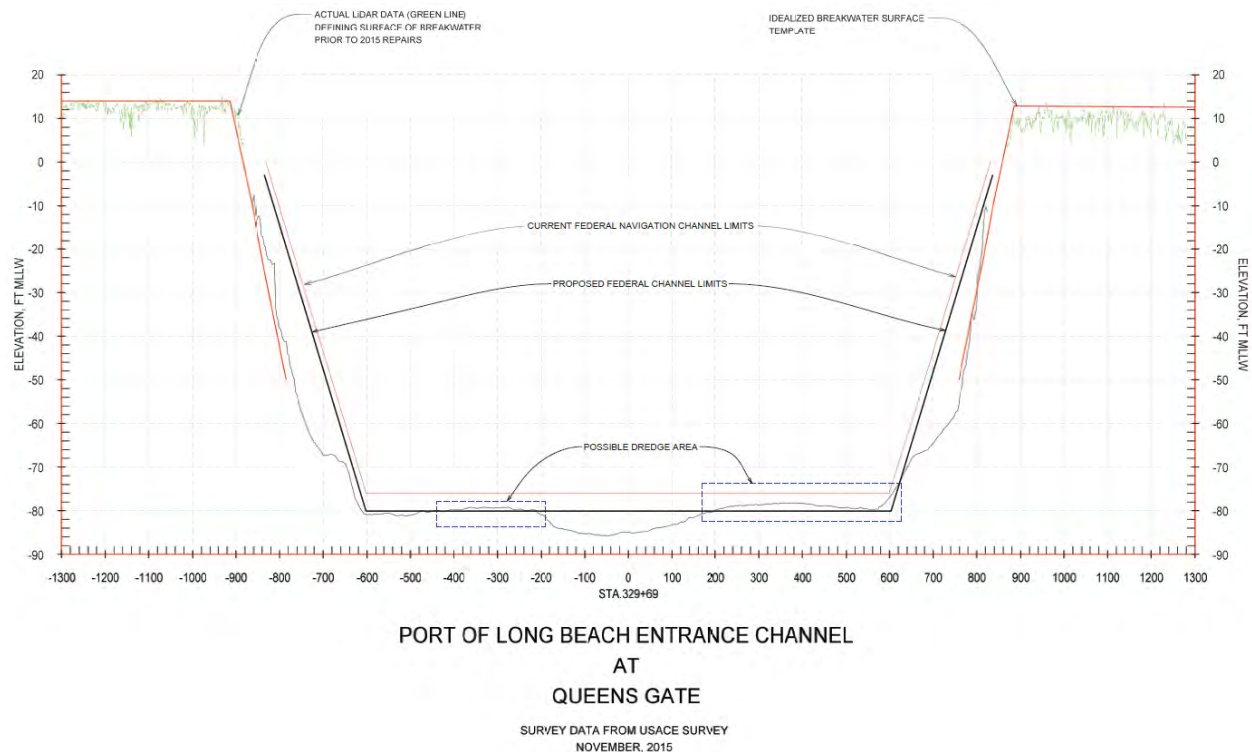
Cross-section of POLB Approach Channel and Breakwaters at Queen's Gate, with current and proposed federal navigation channel limits
